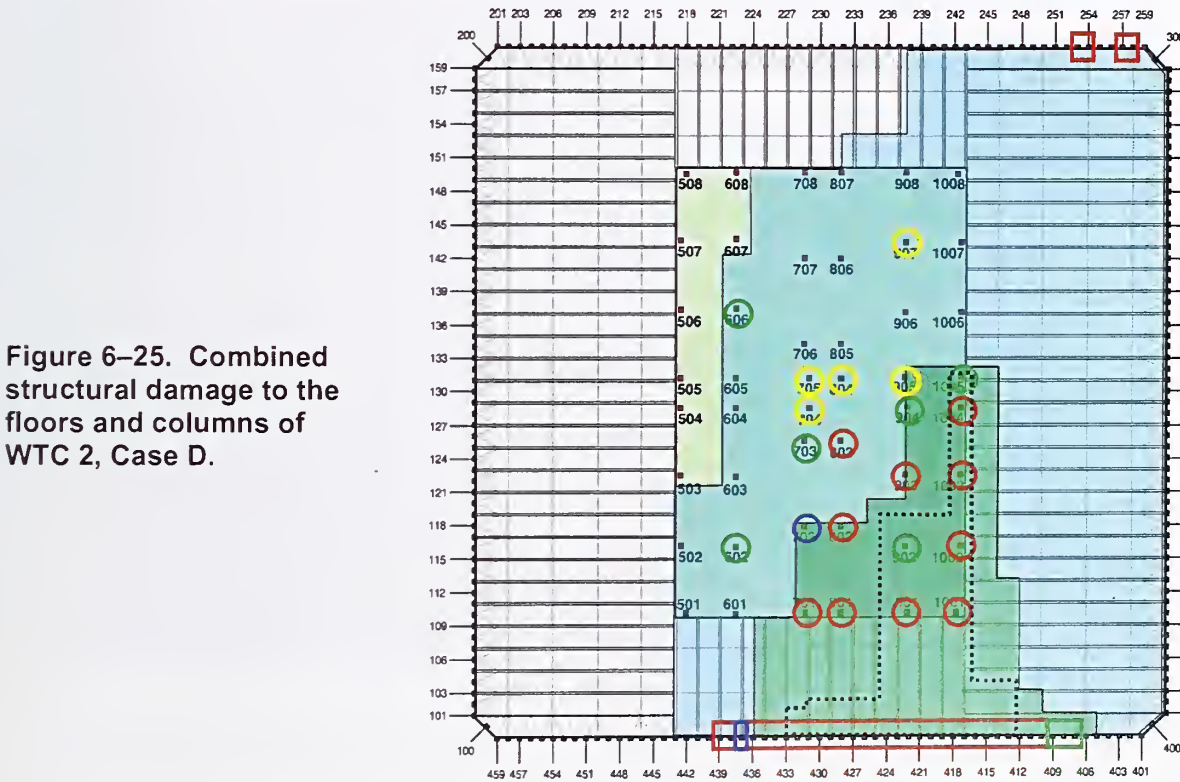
Combined structural damage to the floors and columns of WTC 2, Case D.
